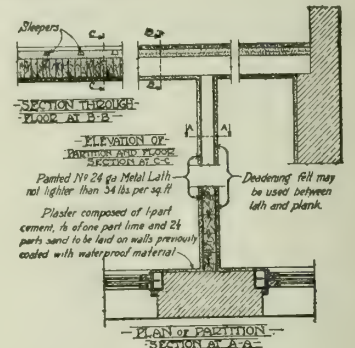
TYPICAL DETAIL FOR MILL CONSTRUCTED BUILDINGS, IN WHICH WOOD IS PROTECTED BY METAL LATH AND PLASTER
